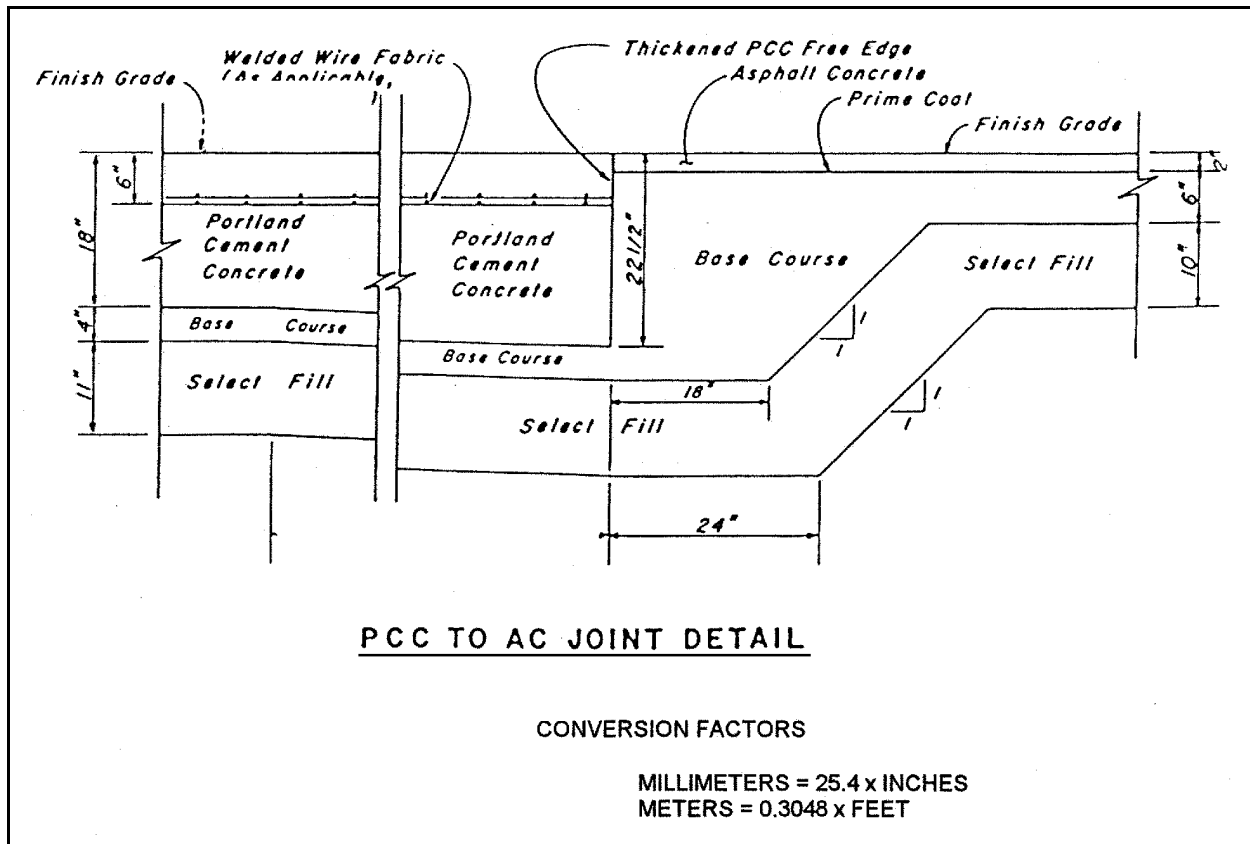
PCC to AC joint detail (very little traffic expected)
